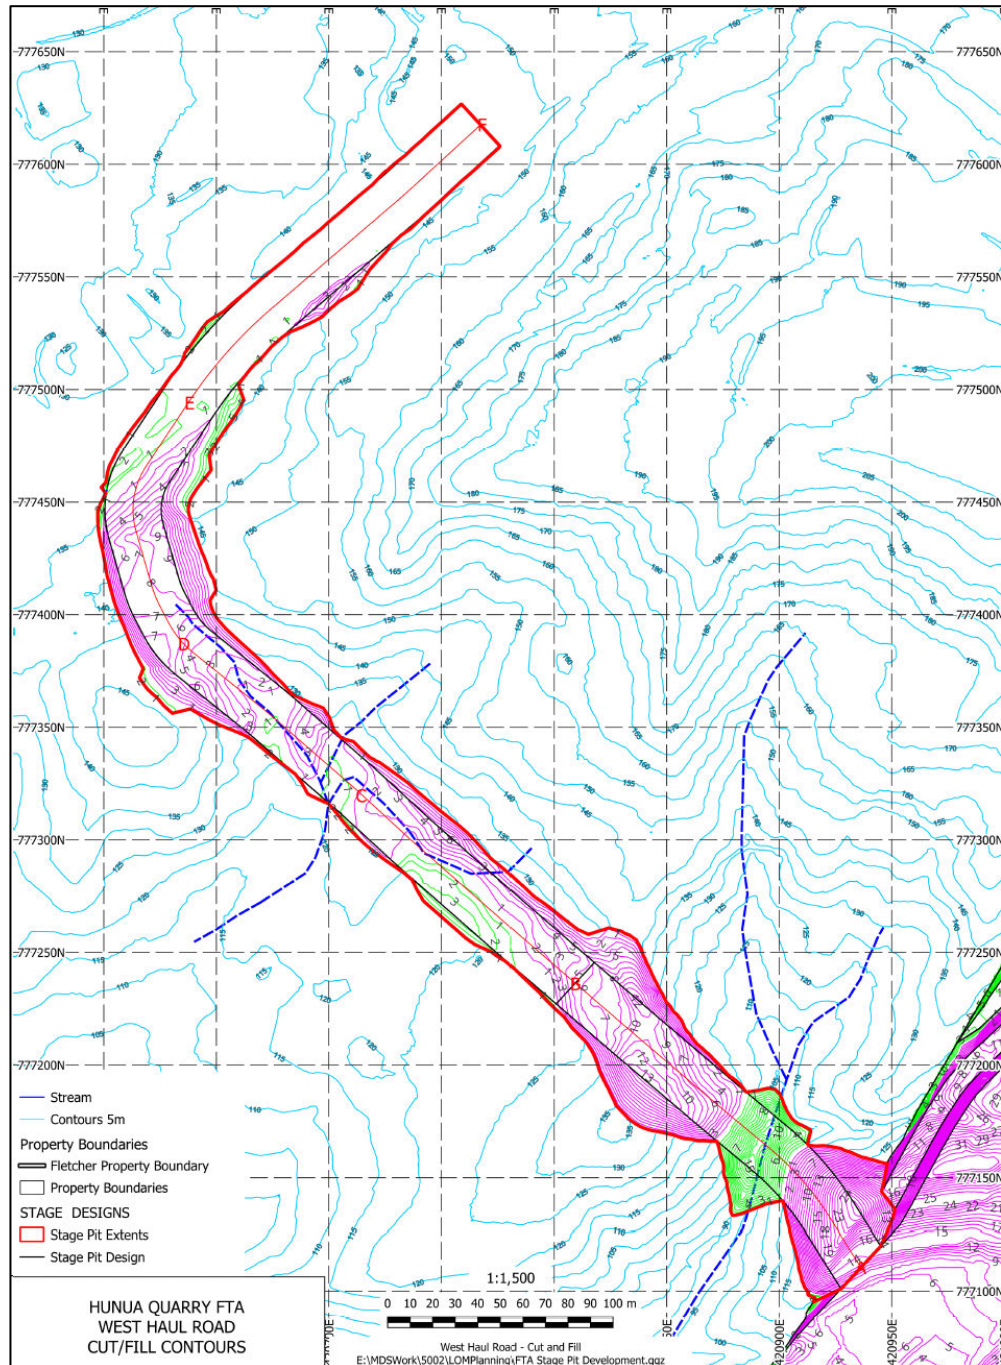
Cut/ Fill plan of the western access road with cut areas (pink) and fill areas (green) (source: Winstone Aggregates)
